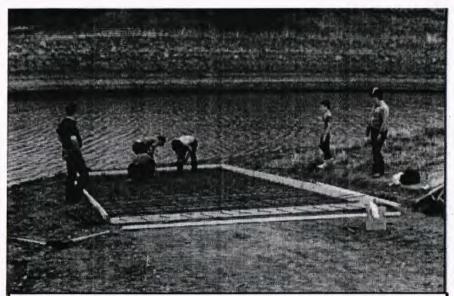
= The base has been prepared at the proper 12% slope and forms are set in place, from the water line upward to pour the first concrete section (Slab A.). Notice the rebar tied one foot on center from both ways with rebar left sticking out the top of the forms which willbe used to tie into Slab "B".
